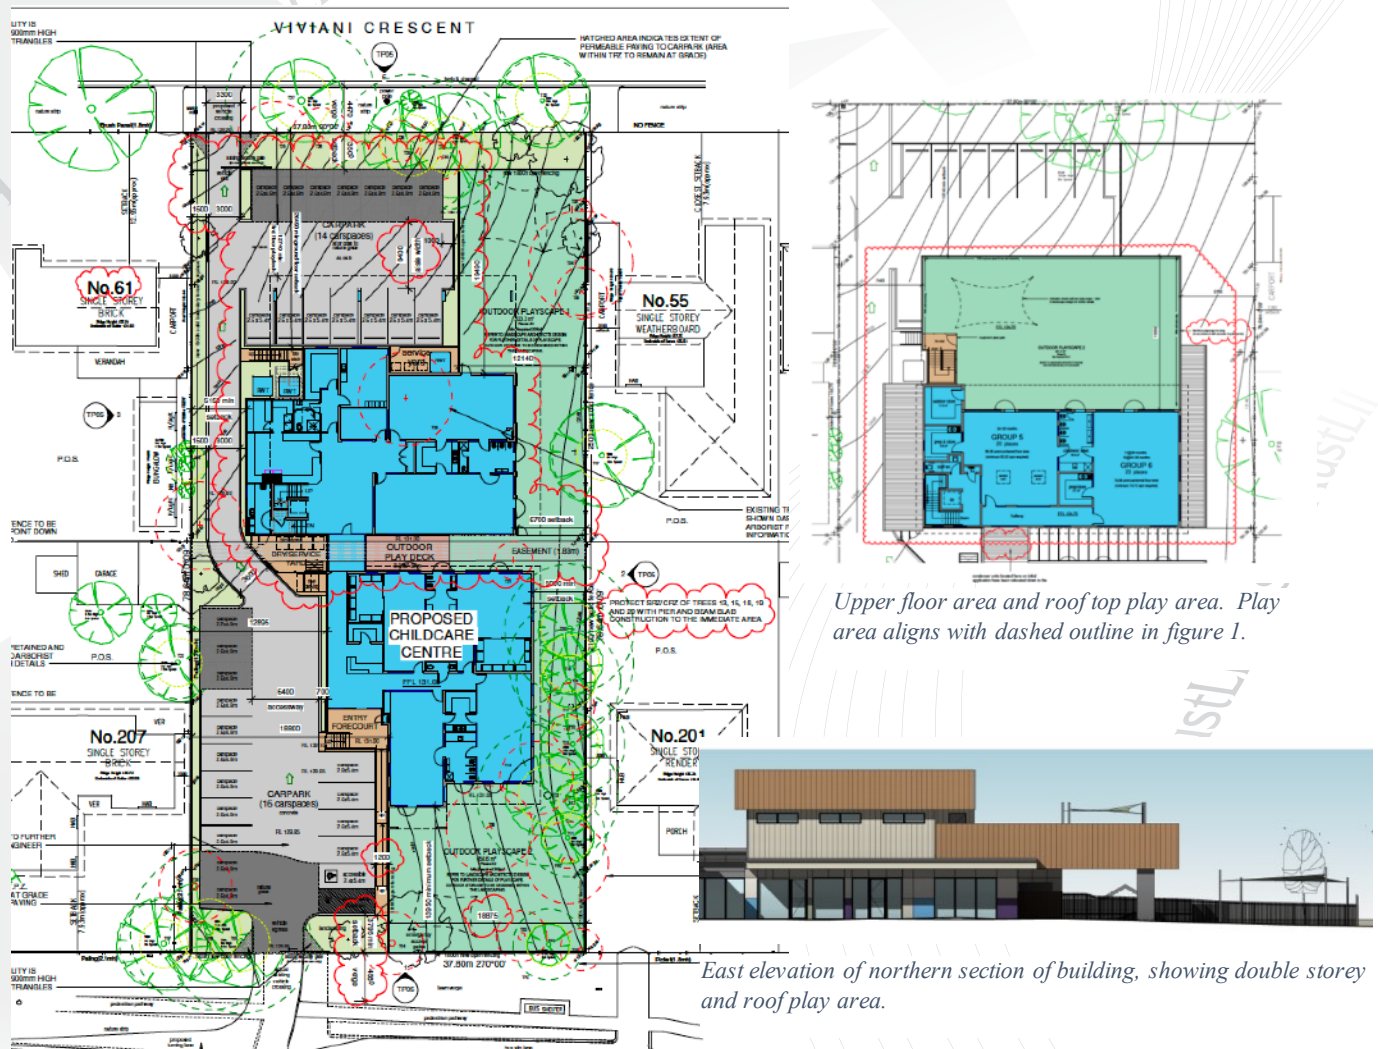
Ground floor layout of proposal with inserts of showing the upper level and east elevation of the northern building.
